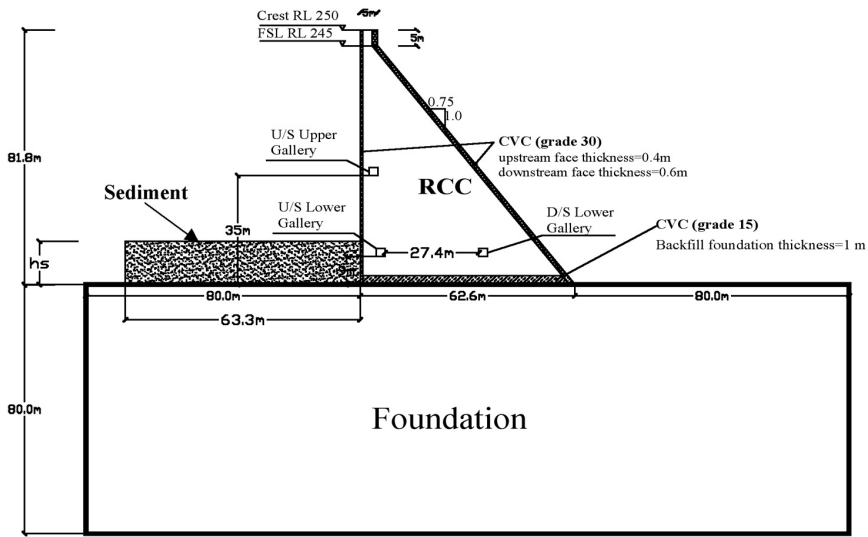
Structural geometry of the RCC dam-sediment-foundation system at the deepest section
